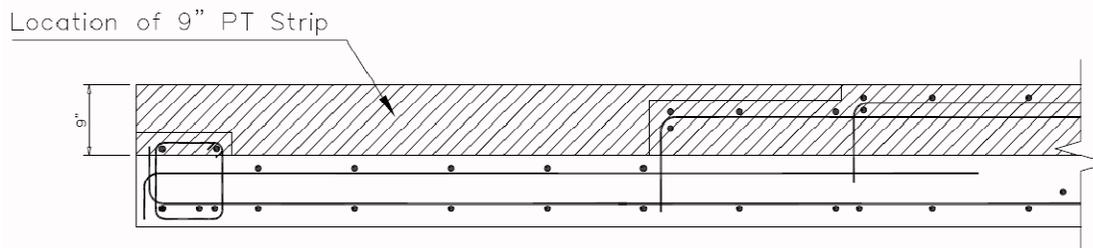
Existing Balcony Cross Section with 9" PT Slab Superimposed
